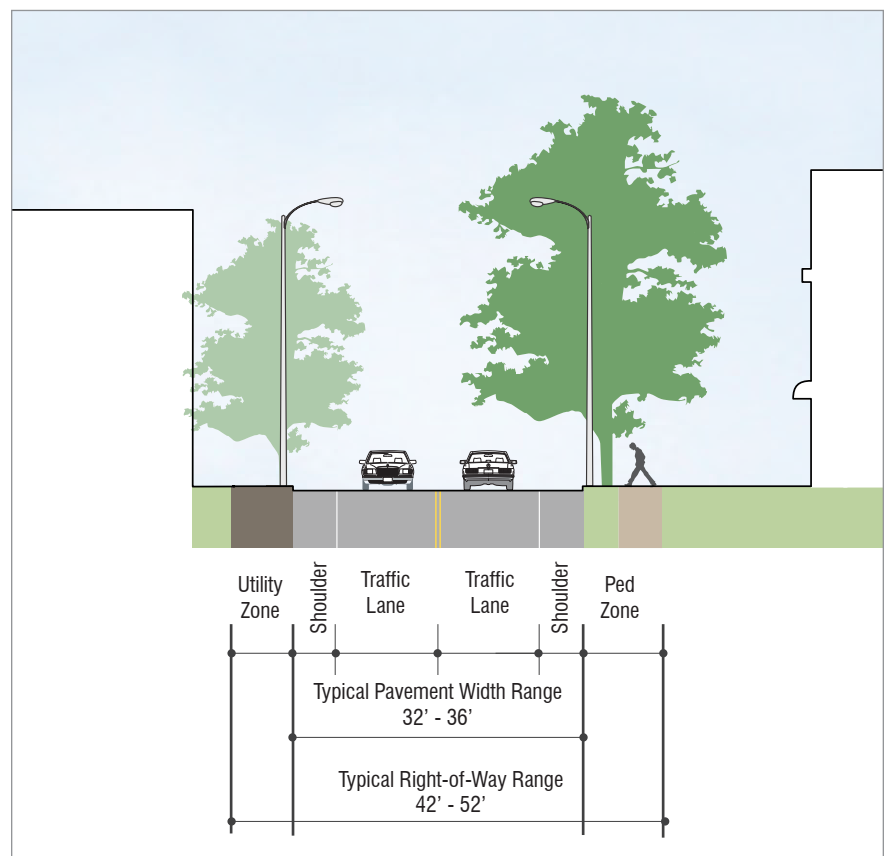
Typical Existing Street Section for 'Commercial/ Rural Highway' Typology
